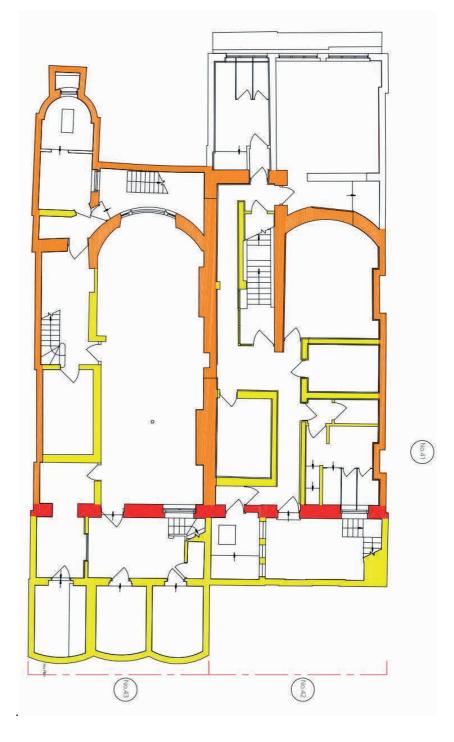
Significance plan of the basement floor of 42 Russell Square
